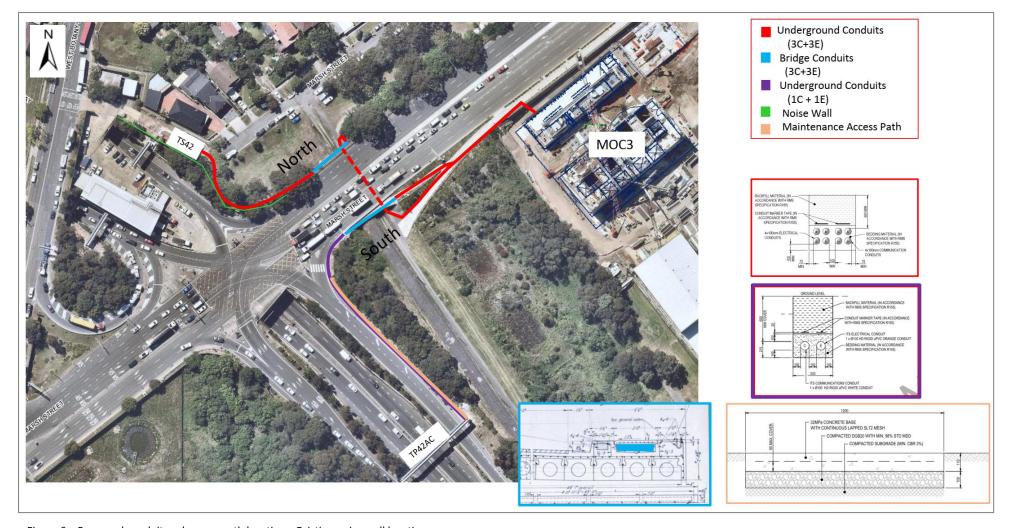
Proposed conduit and access path locations. Existing noise wall location.
